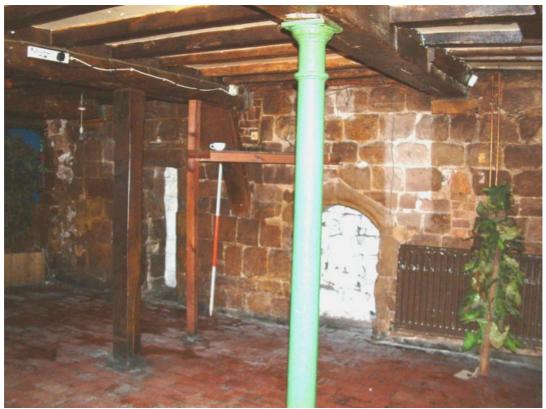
West room, ground floor of Todd's Wine Bar looking south-east
